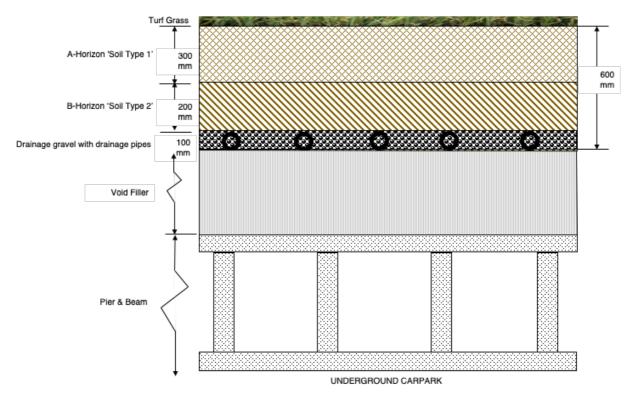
Standard Weight Active Turf B-Horizon 'Type 2' (On-Slab)
